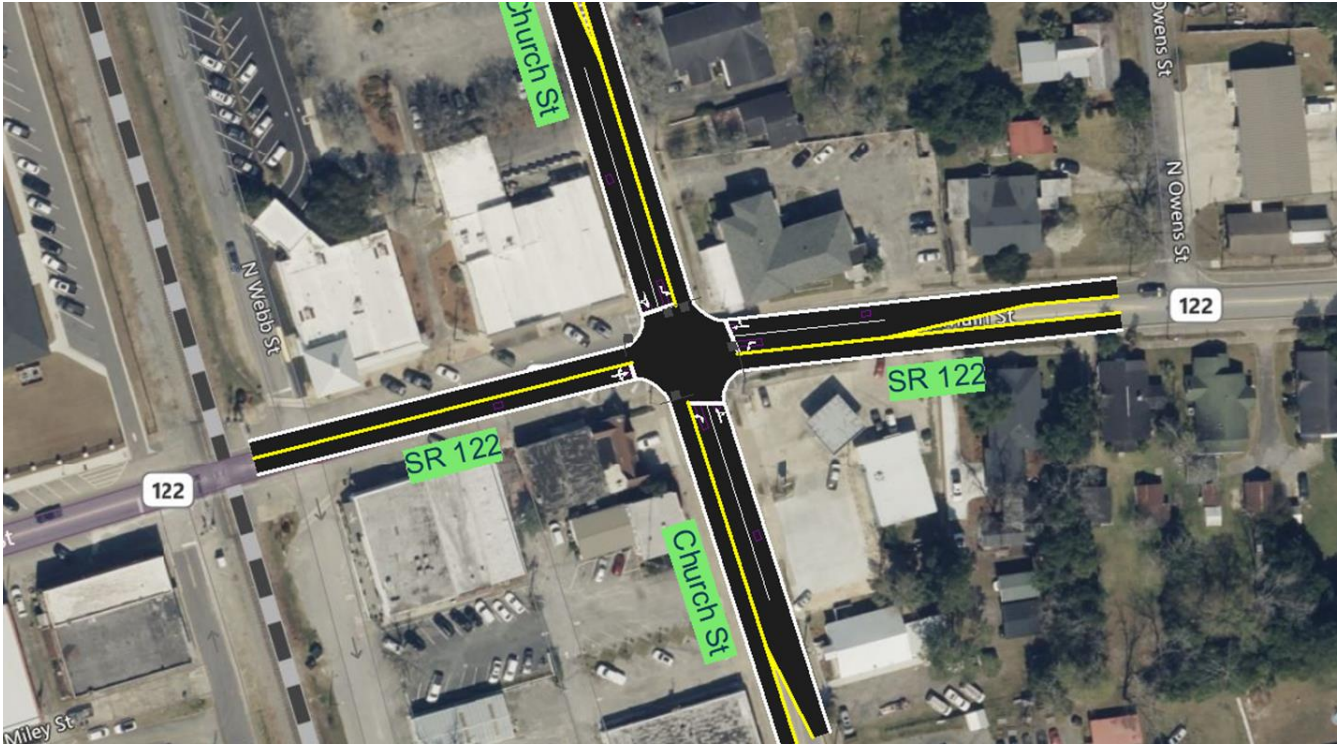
Proposed Intersection Improvements at SR 122 and Church St
